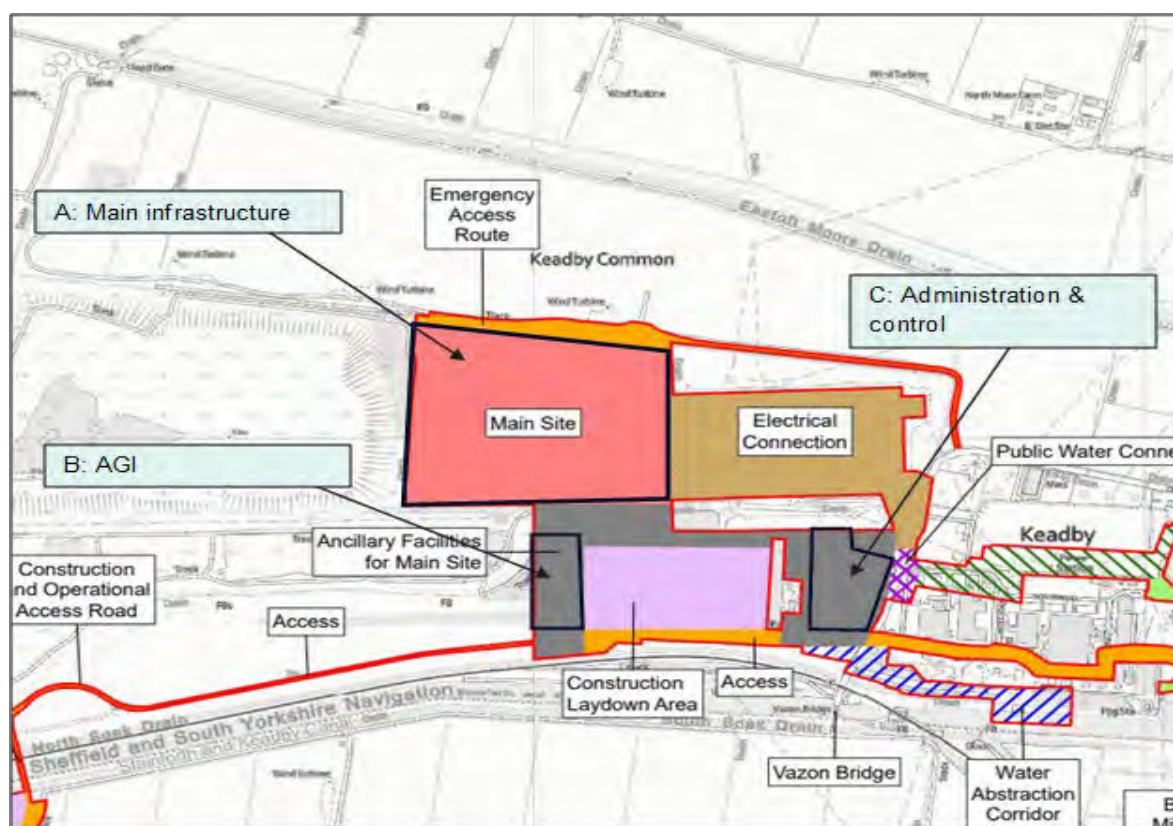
A2.3 Main development areas (extract of indicative site layout, Attachment B)
